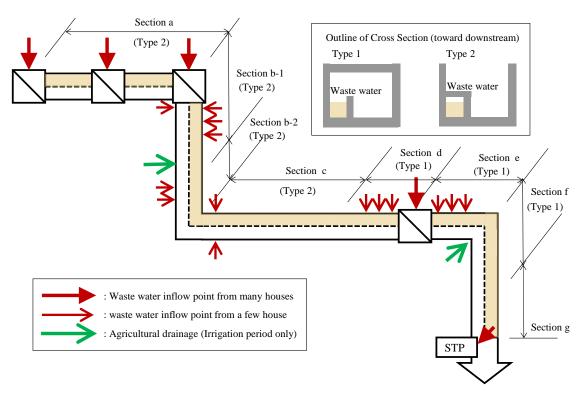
Cross-section of each section in Plan A' and inflow point
